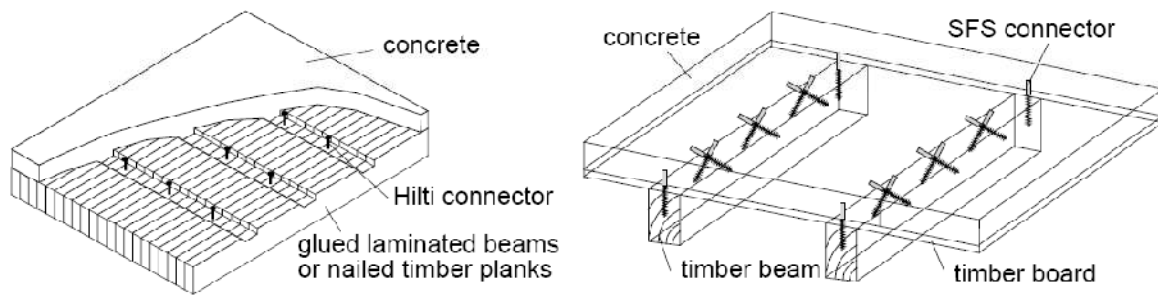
The Solid Timber Deck and Timber Beam Systems Under Study in Zurich (Frangi and Fontana, 1998)
